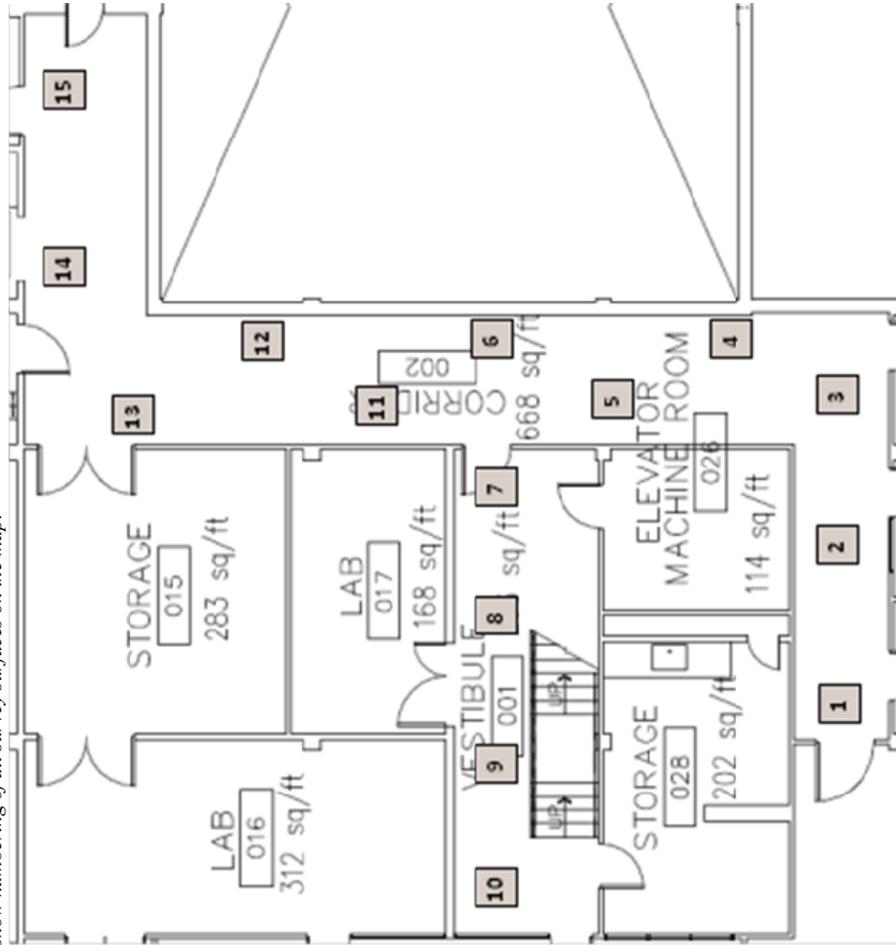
MAGILL HALL ROOMS 1 AND 2 FLOORS
